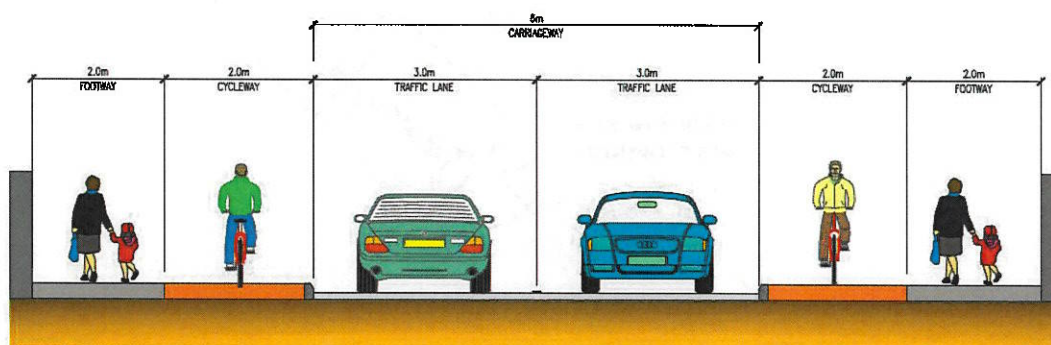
Typical Cross Section for Chapel Road in Section 1
